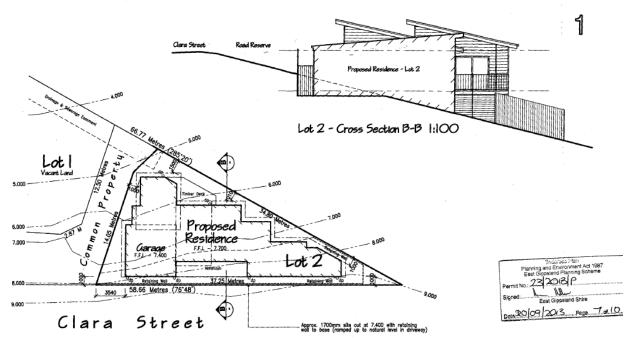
Endorsed Layout/Cross Section Plans (lot 2) pursuant to permit 23/2013/P
